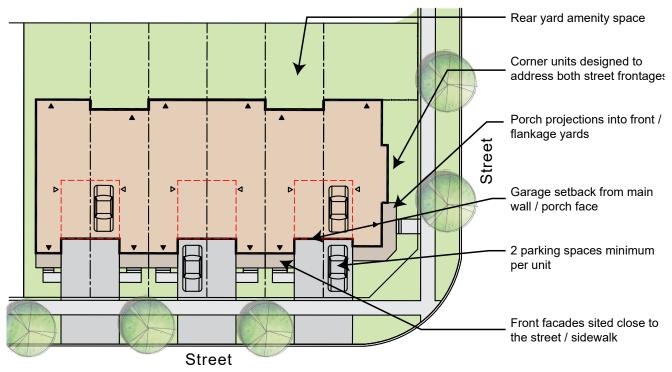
Conceptual Demonstration Site Plan For Street Townhouses
